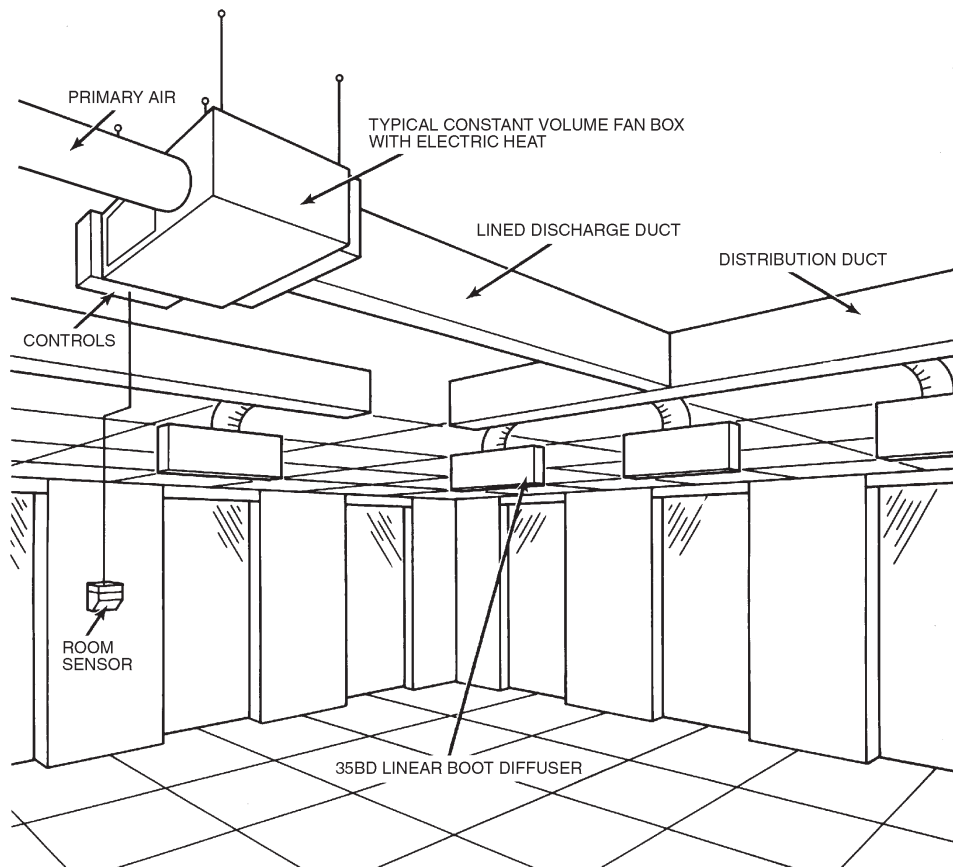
Typical Perimeter Installation — Constant Volume Fan-Powered Box
